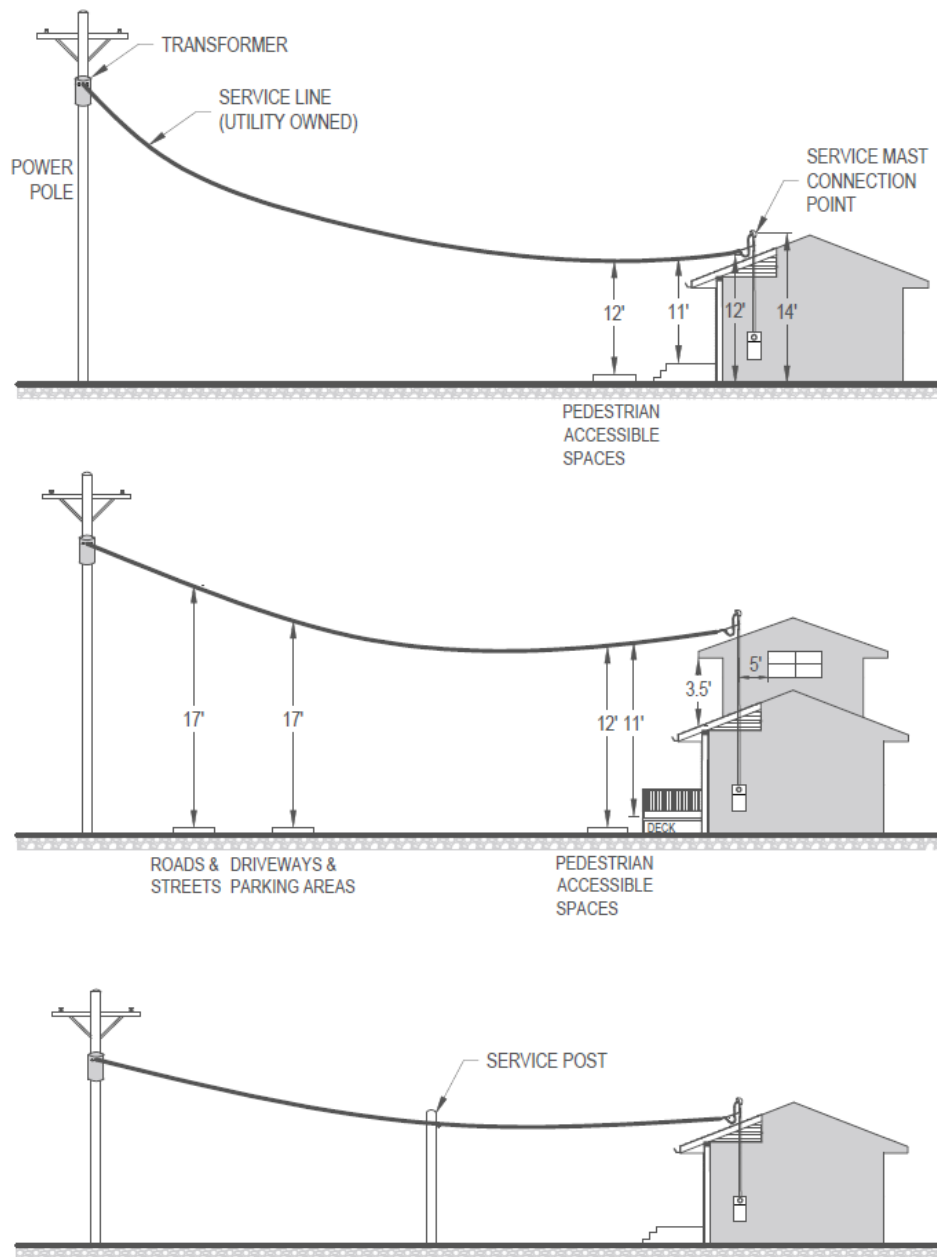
Clearances in Typical Overhead Service Configurations (STD-D-2220)
